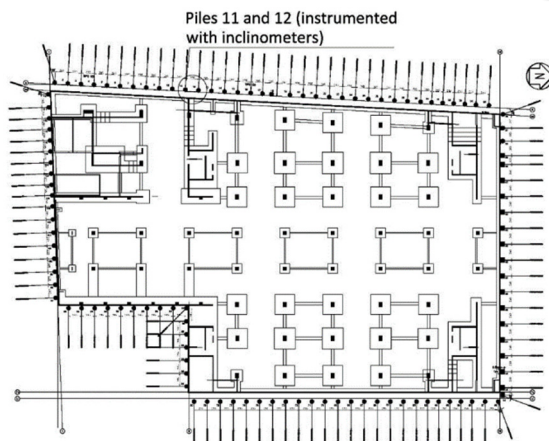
Plan of a retaining wall project with instrumented piles (Pilotes Terratest, 2021b).
